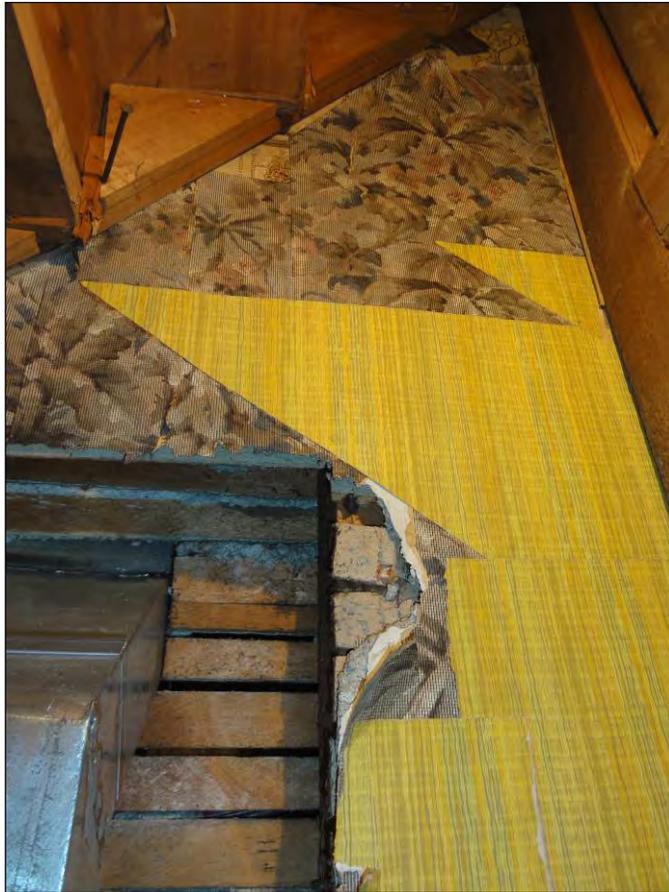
Layers of wallpaper on walls of closet under the stairs. Lathe-and-plaster construction is also evident.
